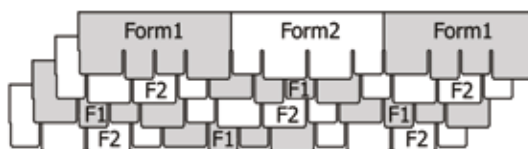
Alternating Döcke PIE bitumen shingles (on the example of a hexagonal shingle).
